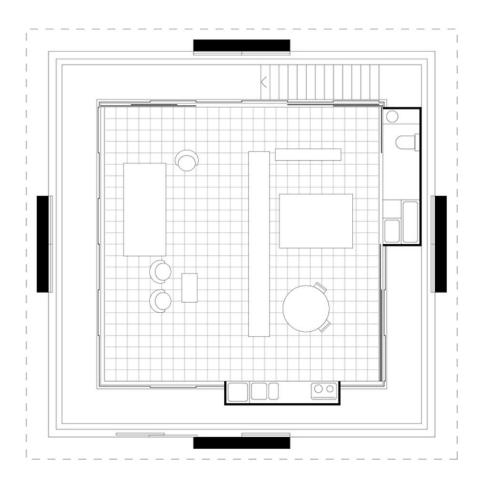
Floor plan of Sky House, Kiyonori Kikutake, 1958
